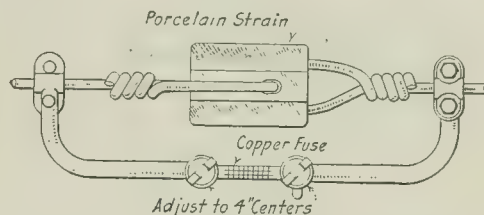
JUMPER ARM AND METHOD OF INSTALLING SECTION FUSE
